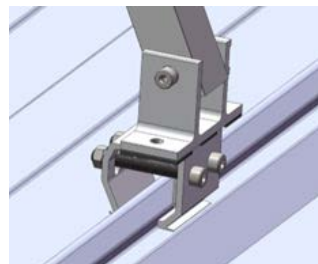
Non-preassembly Rear Leg Installation with Universal Klip-lok Interface
